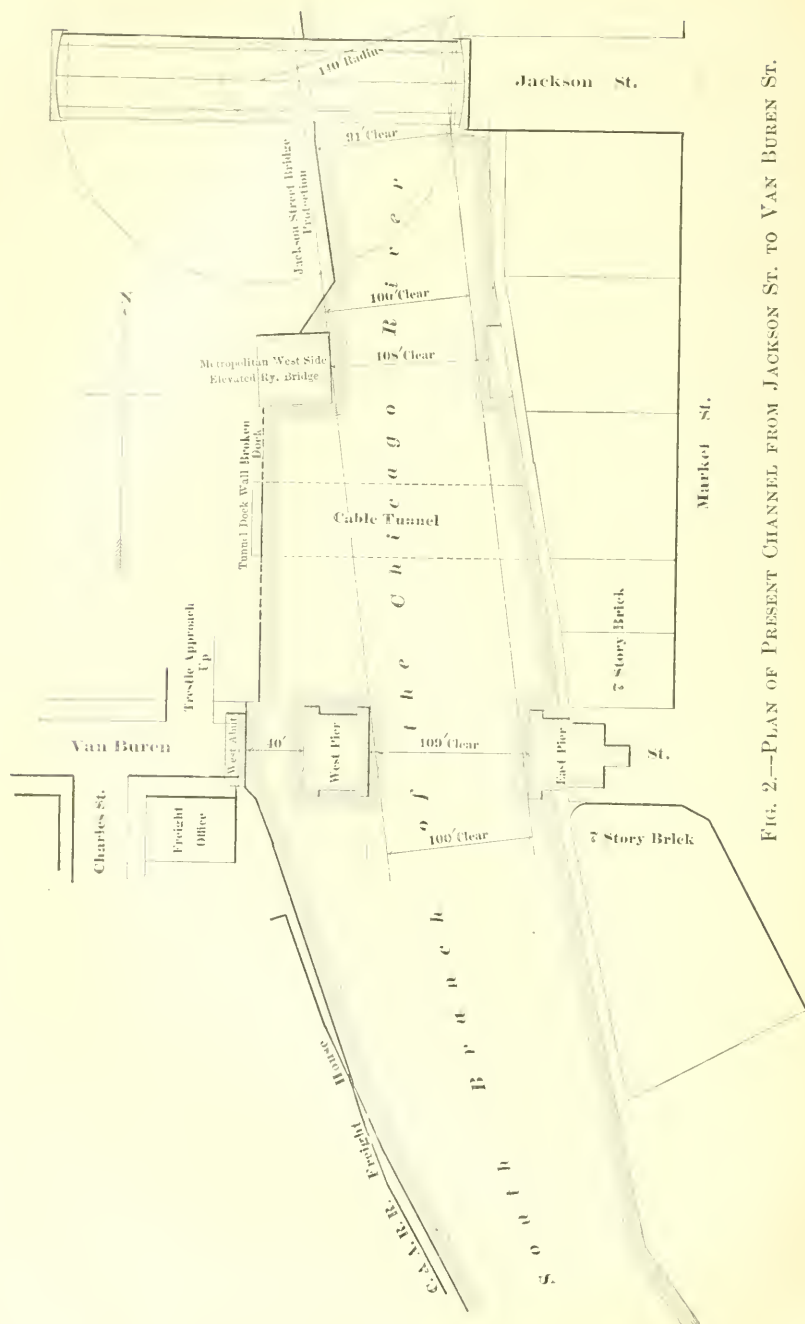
PLAN OF PRESENT CHANNEL FROM JACKSON ST. TO VAN BUREN ST.
